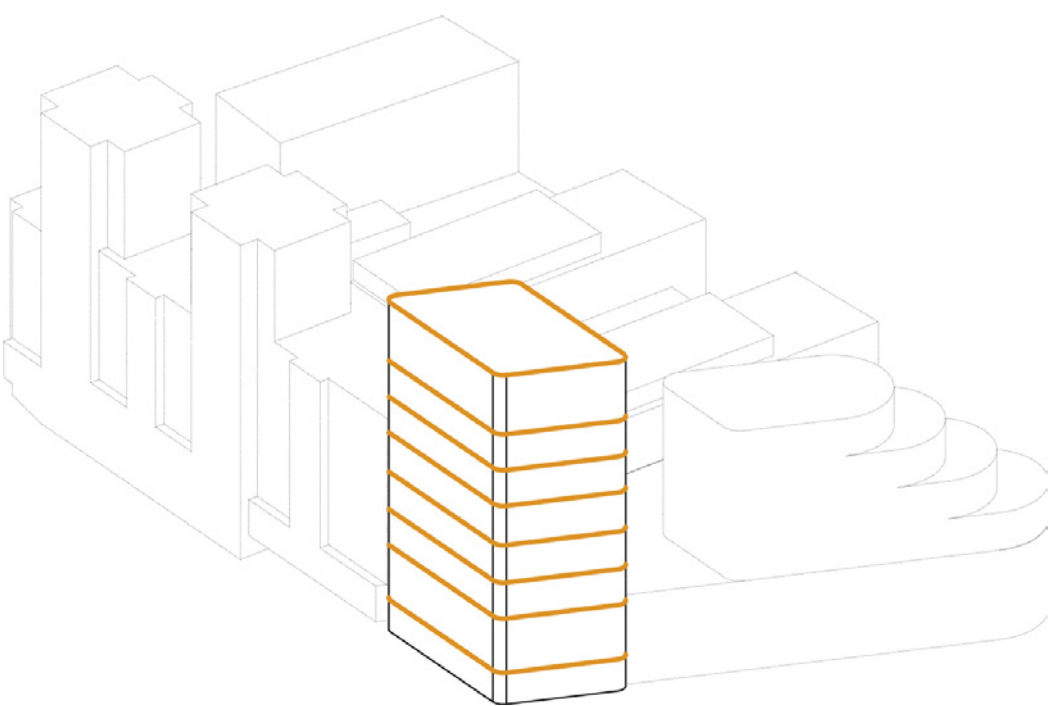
Building B1 articulation - Primary horizontal articulation
